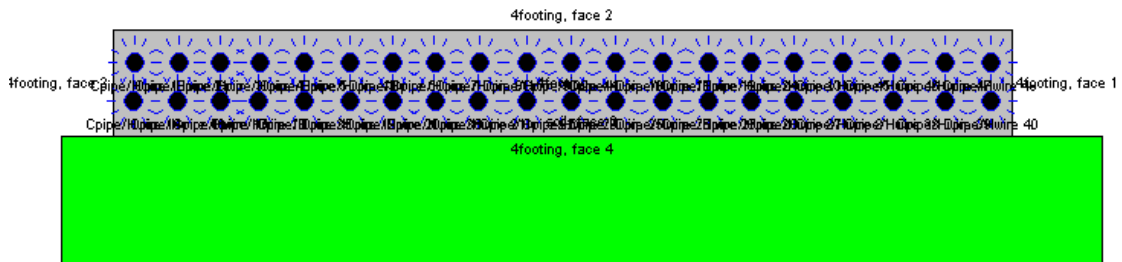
US34 pier 4 footing layout with cooling pipes (not in scale)
